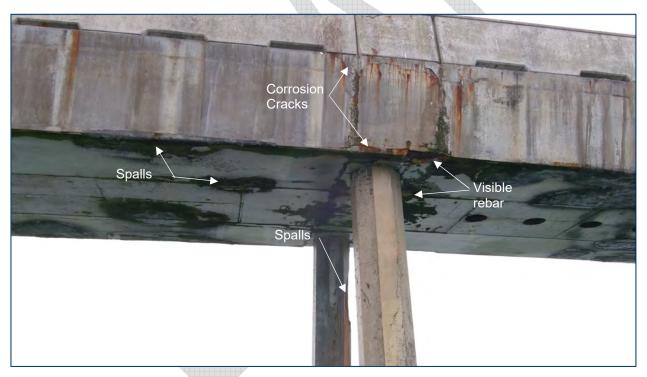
Deck Exterior at Bent 10 - North Face
